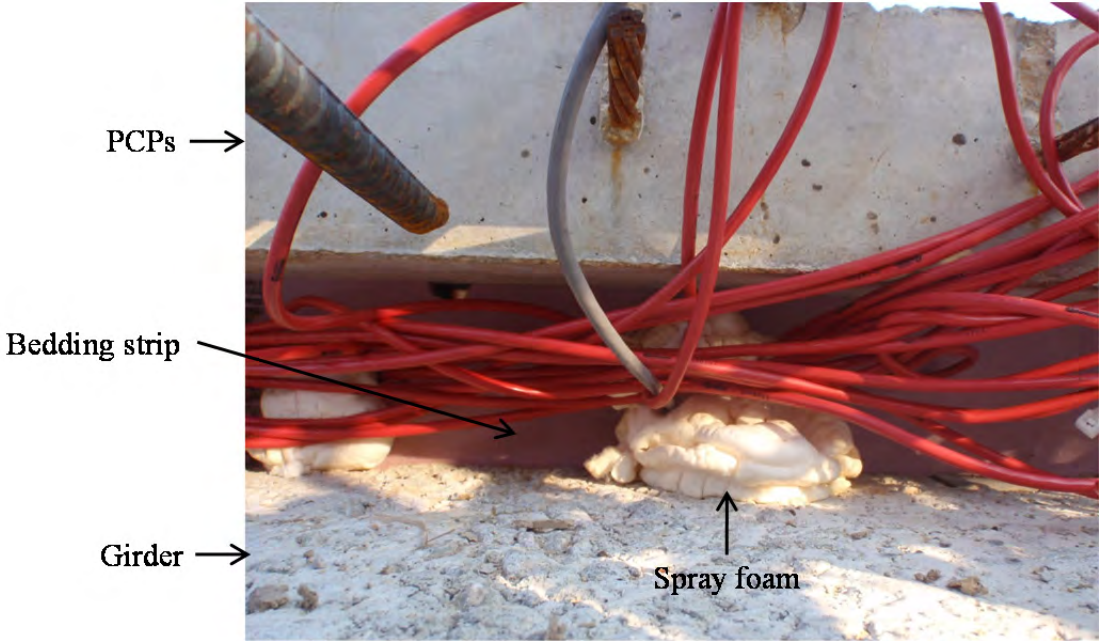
Sealing holes in bedding strip (Spans 1 and 2), Lampasas River Bridge
